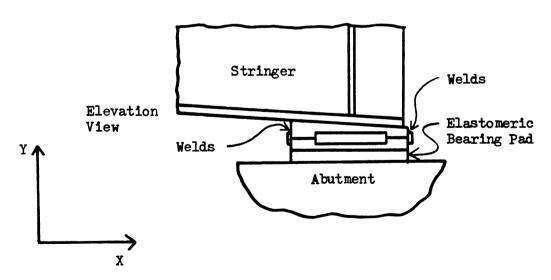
CSCB Deck Bearing Connections at Panel Point 20
